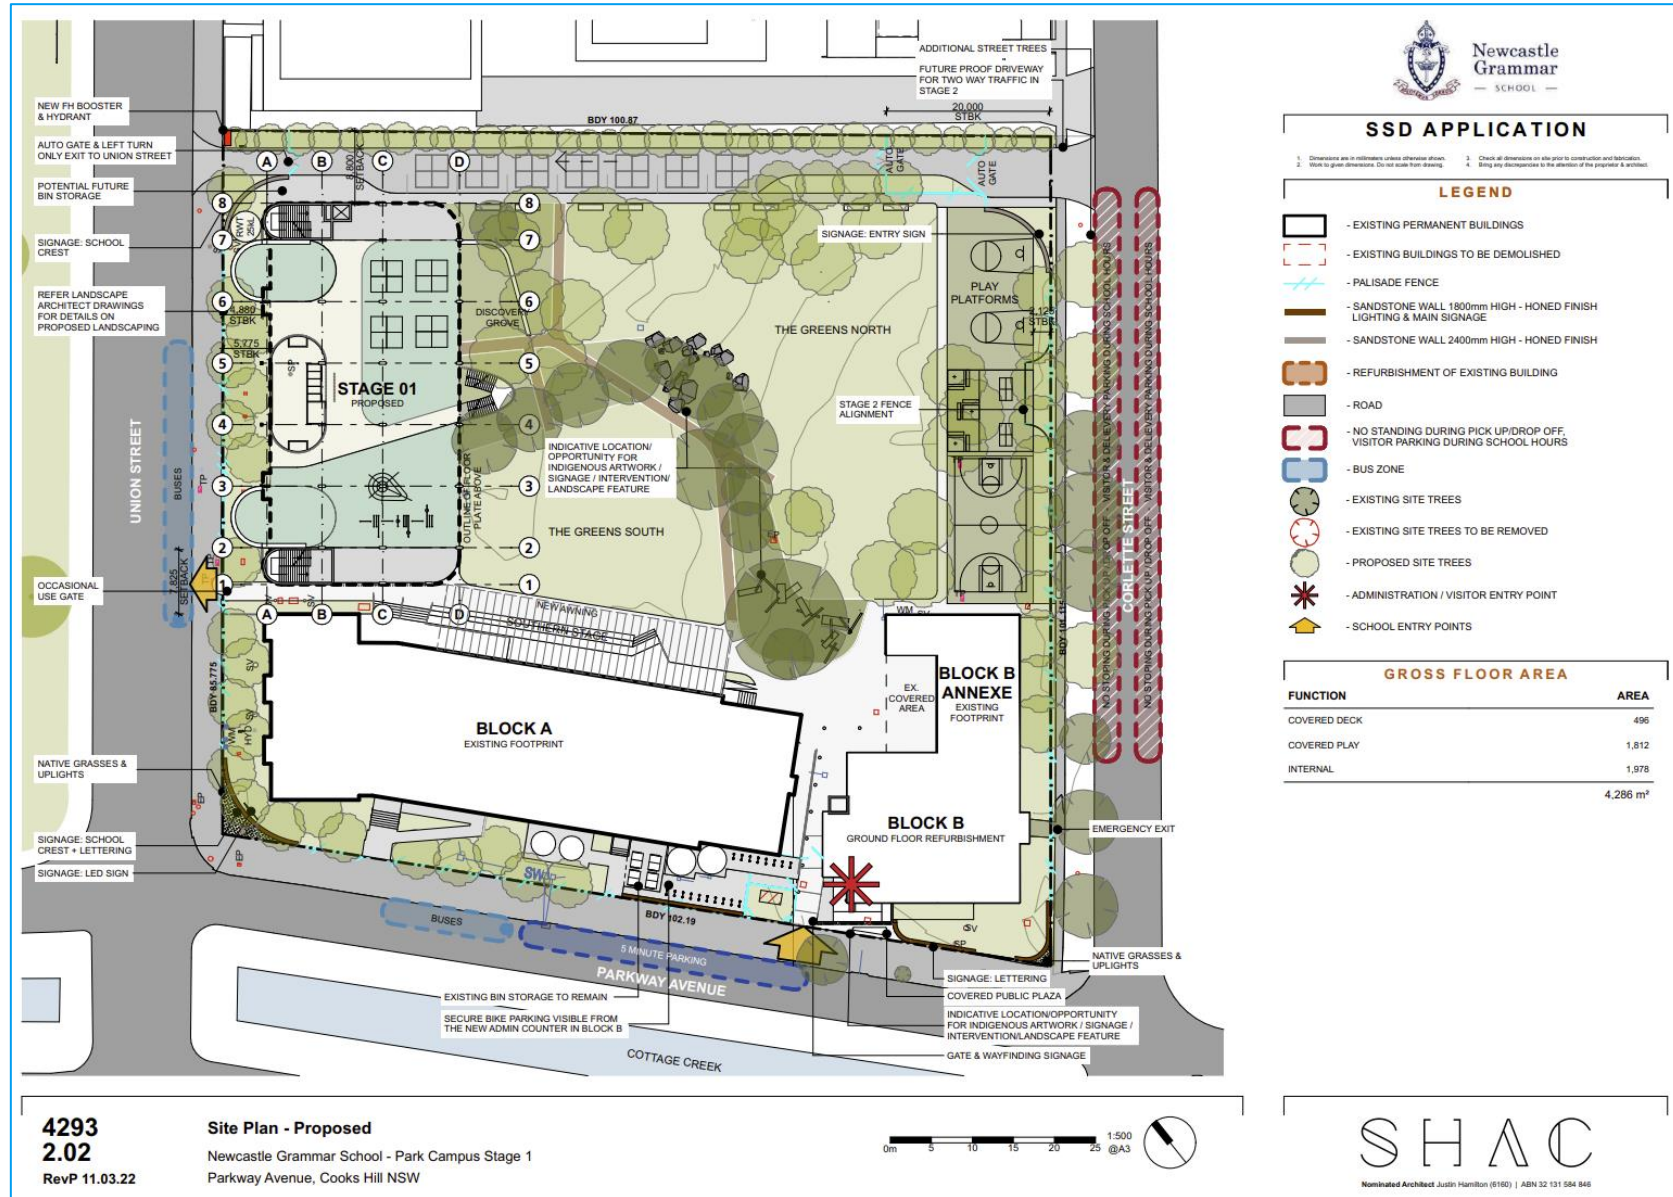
SSD-13895306 Project Stage 1 Site Plan
